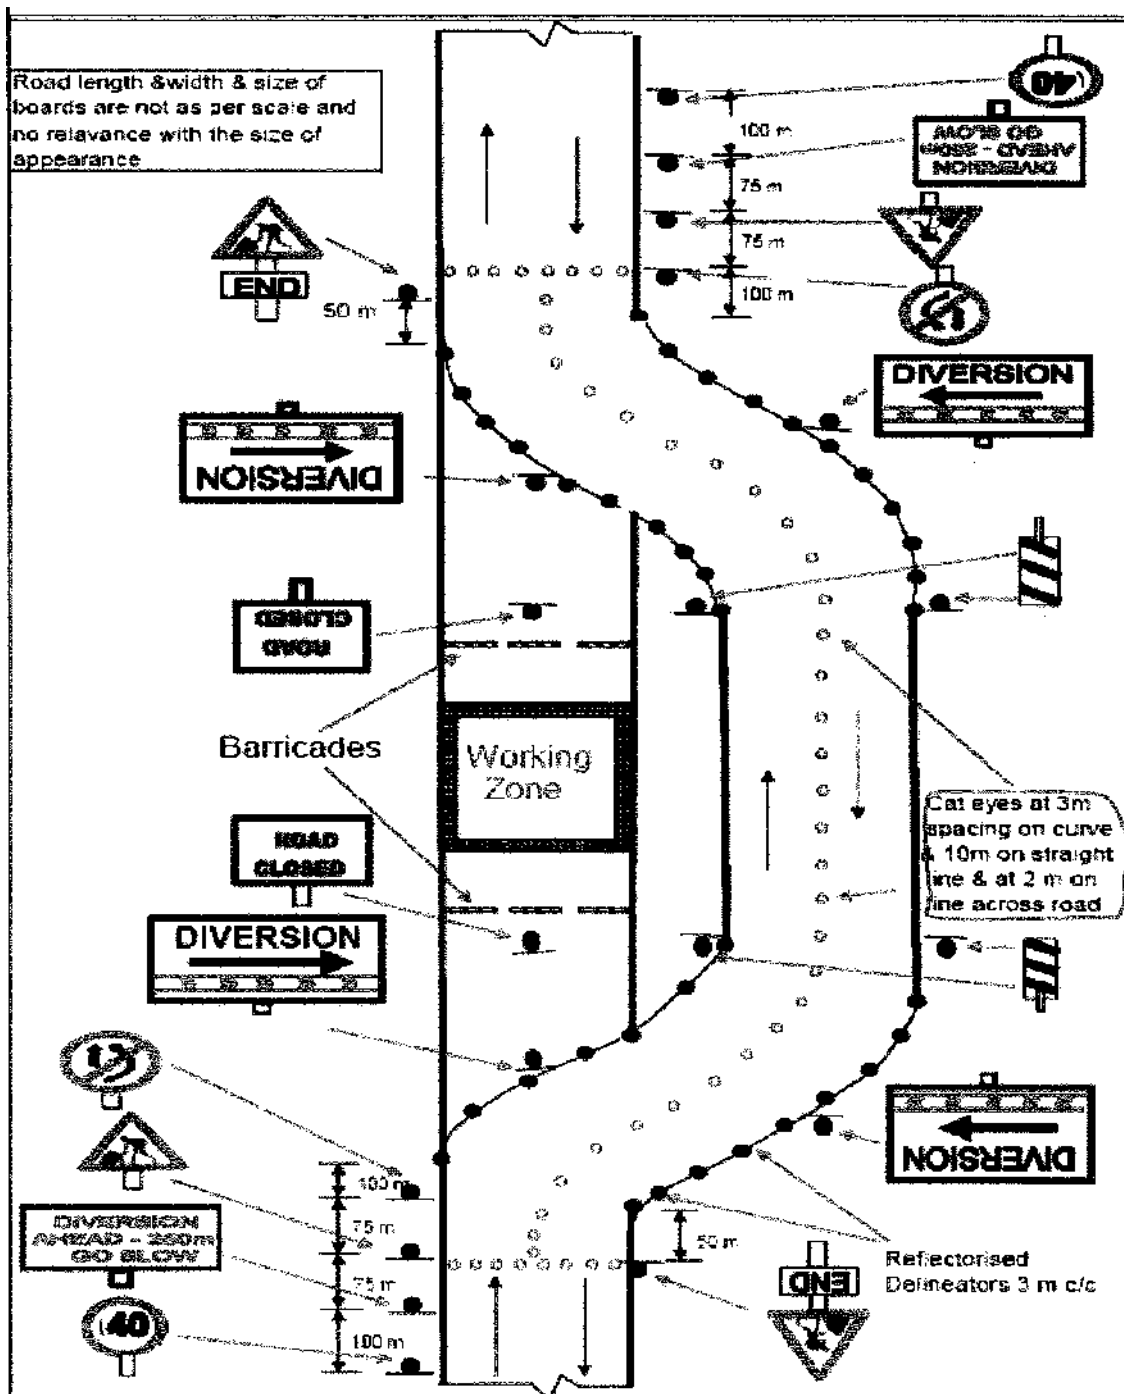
Traffic Management Plan for Diverting the Traffic
